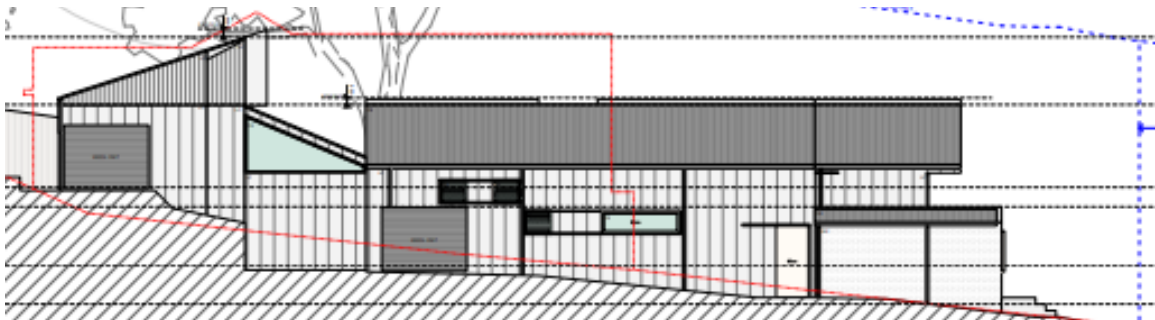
Southern (side) elevation of principal dwelling (source - Adriano Pupilli Architects)
